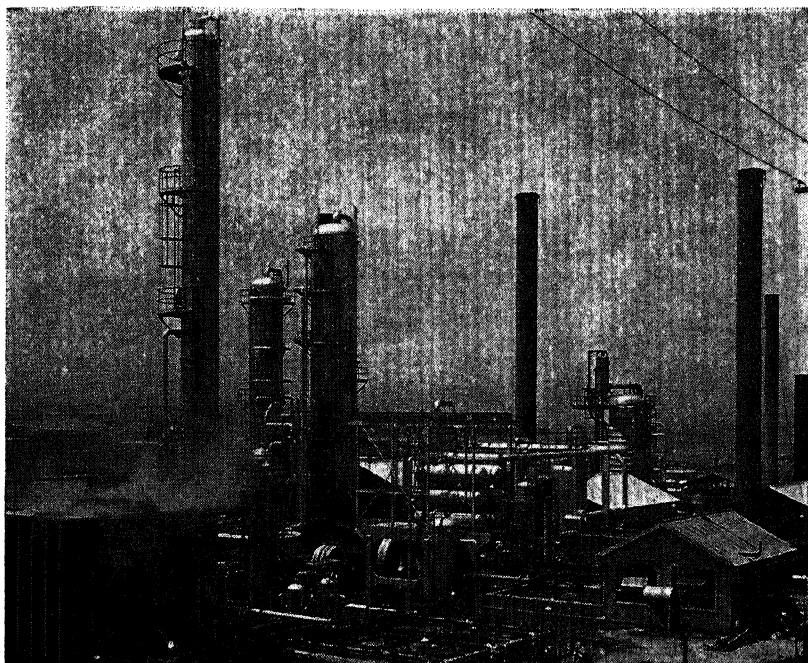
A new \$2,000,000 refinery at Oleum, Calif. Arc welding was used extensively in the fabrication and erection of this modern plant.
